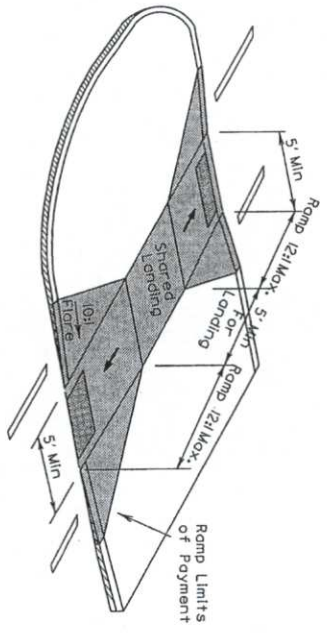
DETAIL SHOWING TYPICAL LOCATION OF CURB
